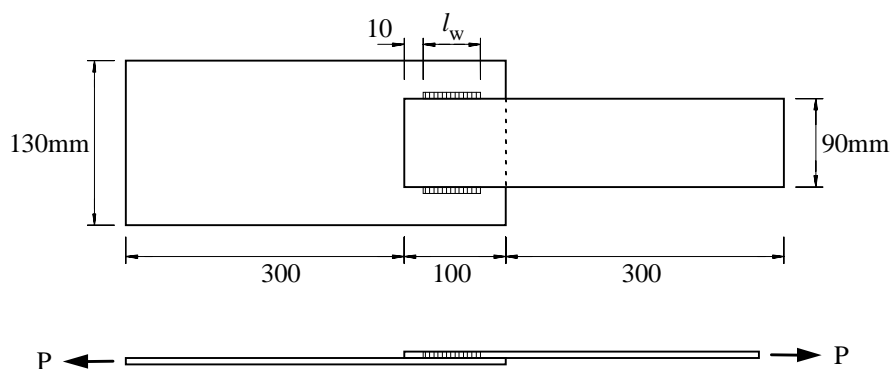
Diagram of a single-lap longitudinal fillet welded connection specimen
